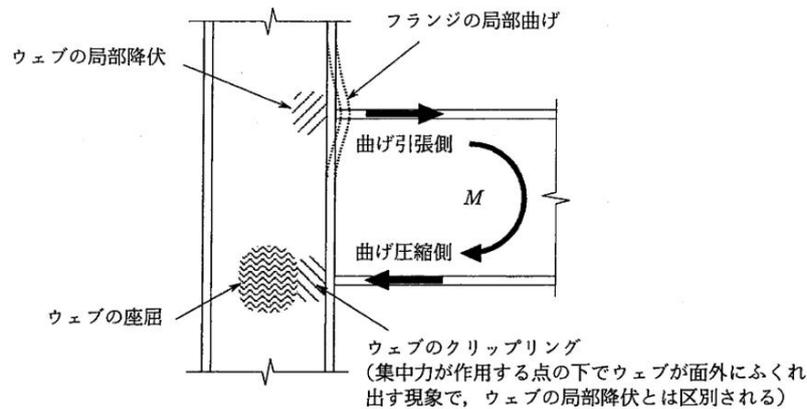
Local failure at the beam joint where continuity plates are not installed
